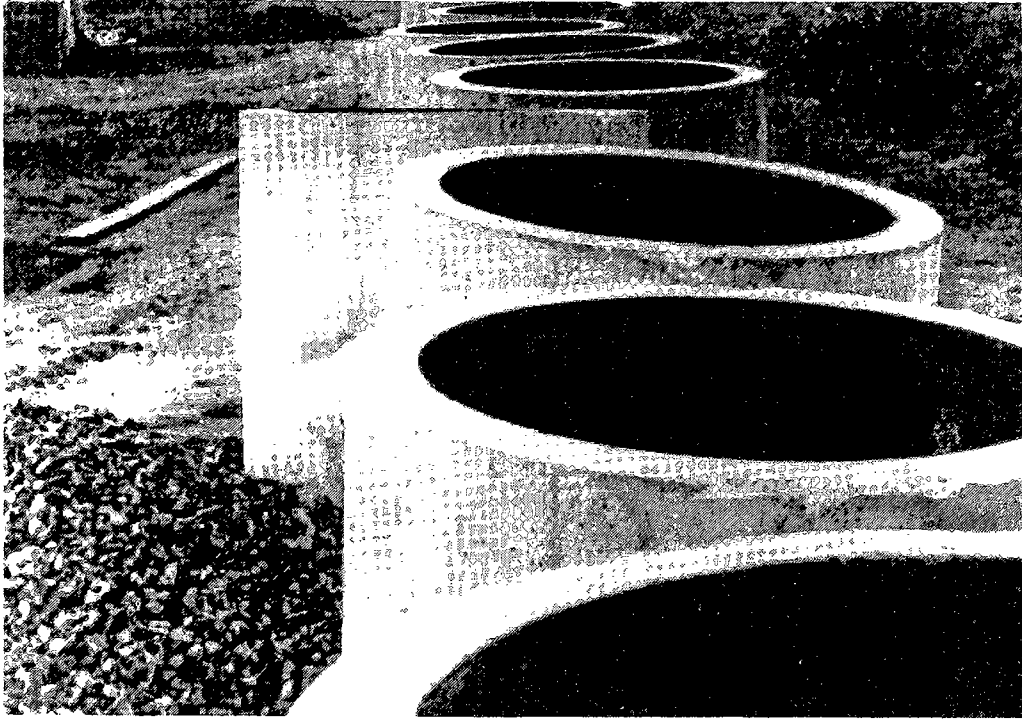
Dia. 180 cm reinforced concrete pipes with resin concrete cores.
